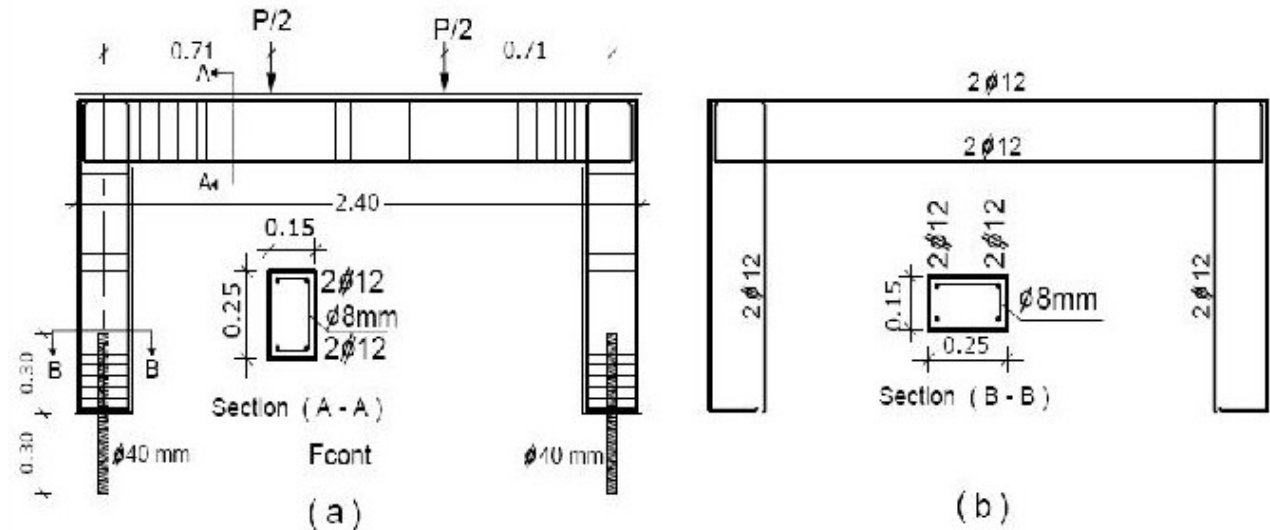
Dimensions and Reinforced Steel Details of Control Specimen
